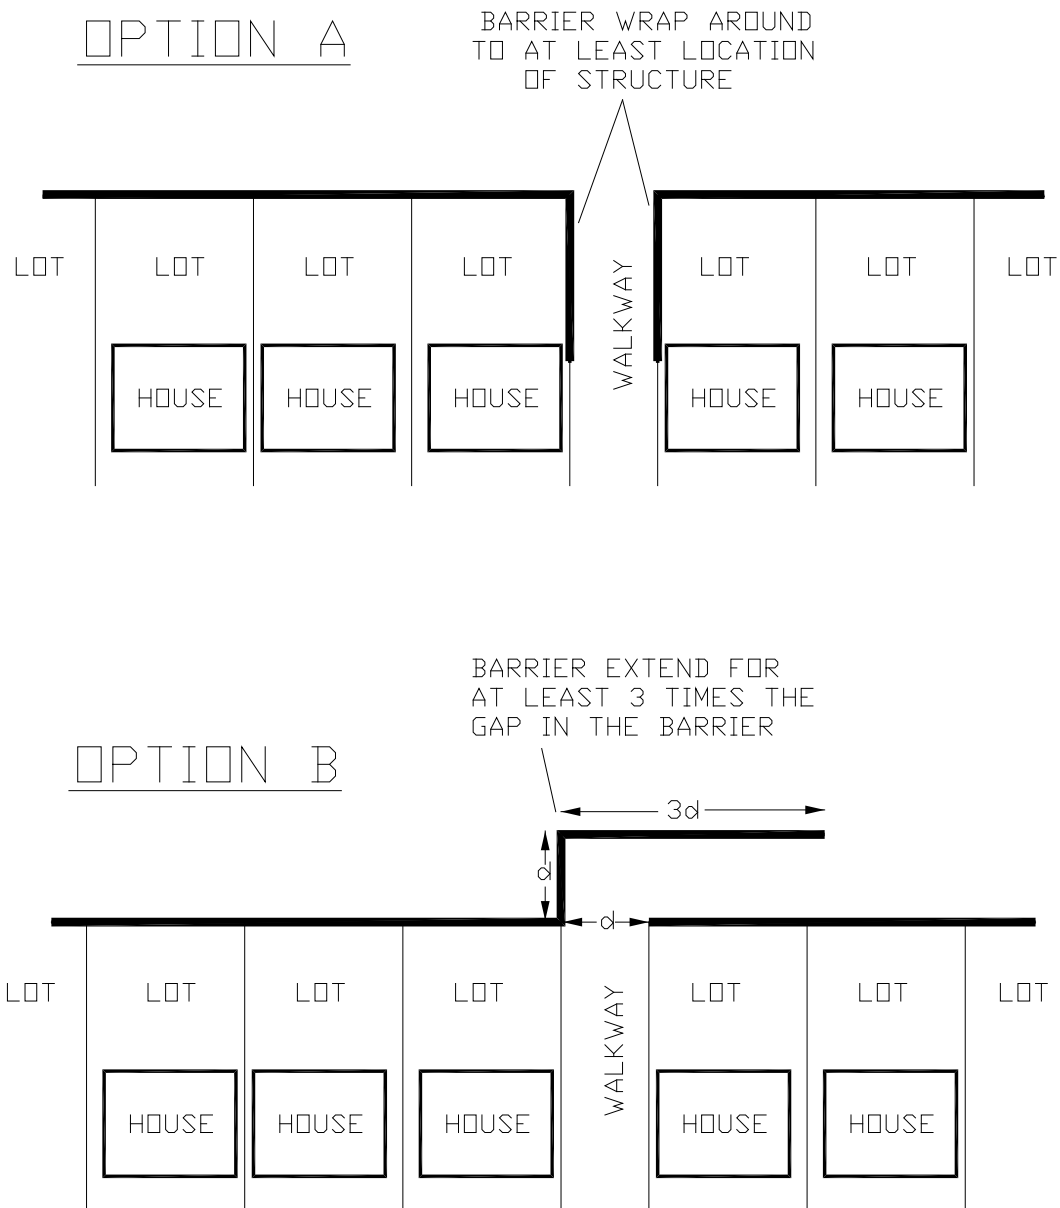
Sample Schematic of Noise Wall Walkway Overlap
